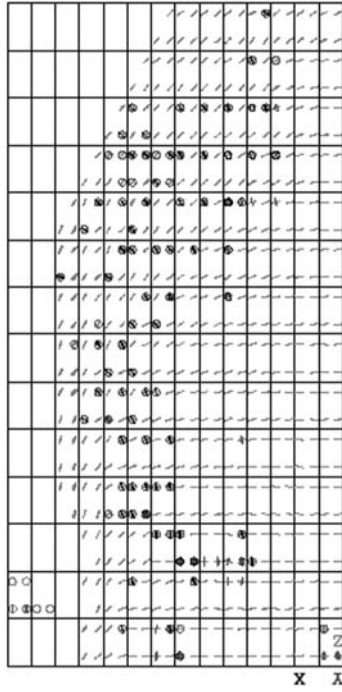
Crack pattern of a shear critical shear wall
